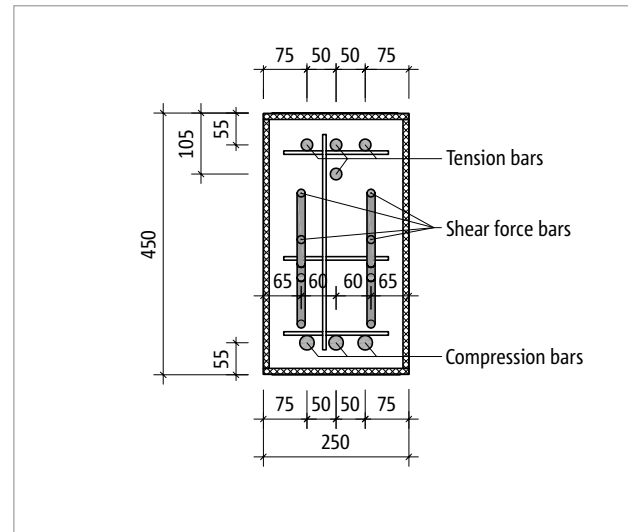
Schöck Isokorb® T type B-M6-V2 in height H450: Product layout
